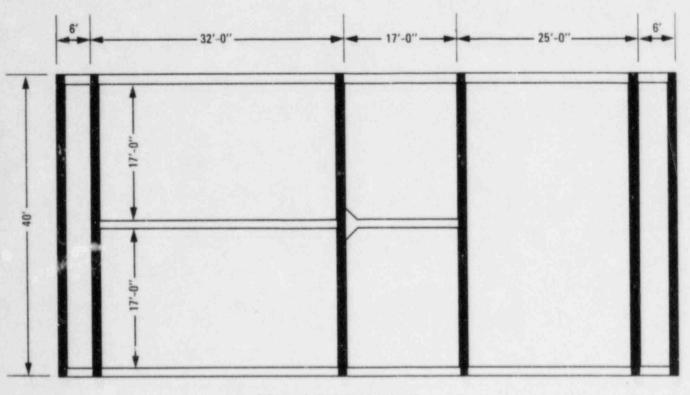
AUXILIARY FEEDWATER PUMPHOUSE ROOF PLAN AND ELEVATION
